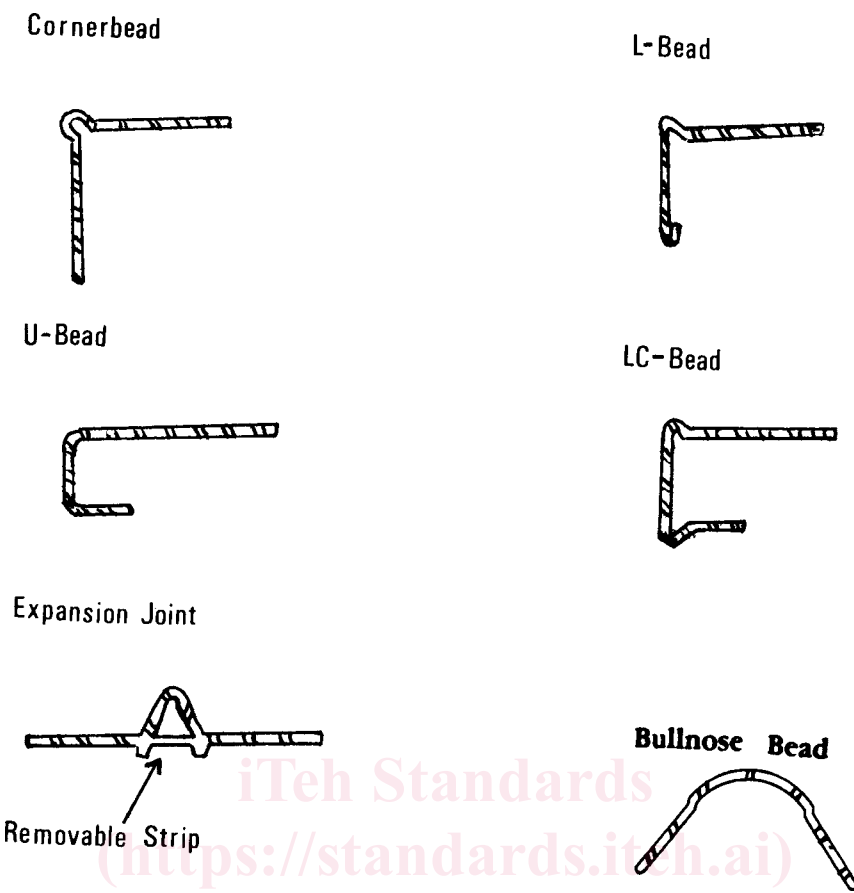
Accessories for Gypsum Wallboard and Gypsum Veneer Base
